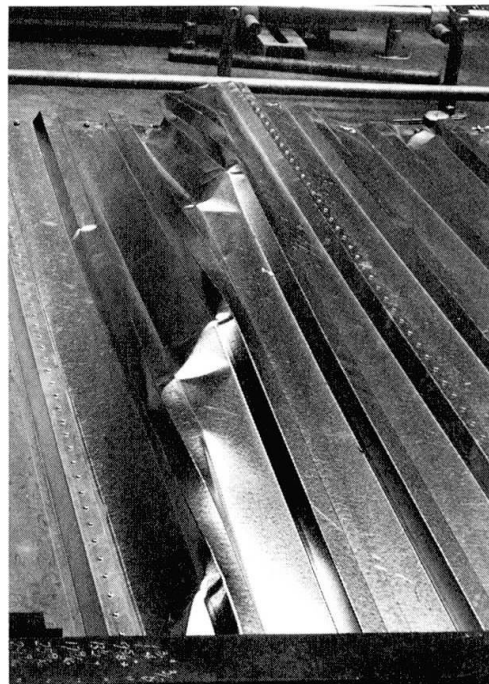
Illustrating Overall Buckling Following Fastener Failure – Test 9.
